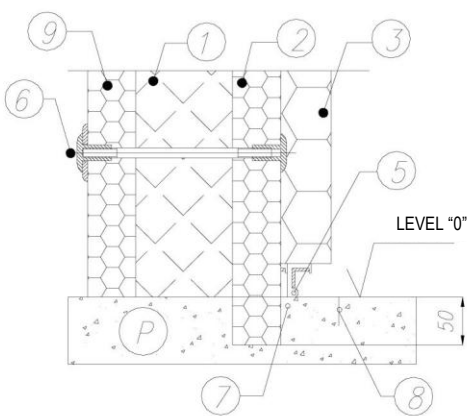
INSTALLATION OF DOORS WITH A THRESHOLD TO CONCRETE FLOORING
